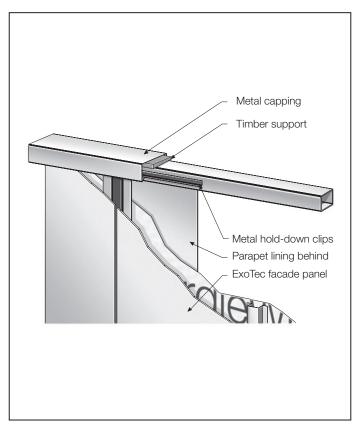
PARAPET CAPPING CUTAWAY DETAIL 1
